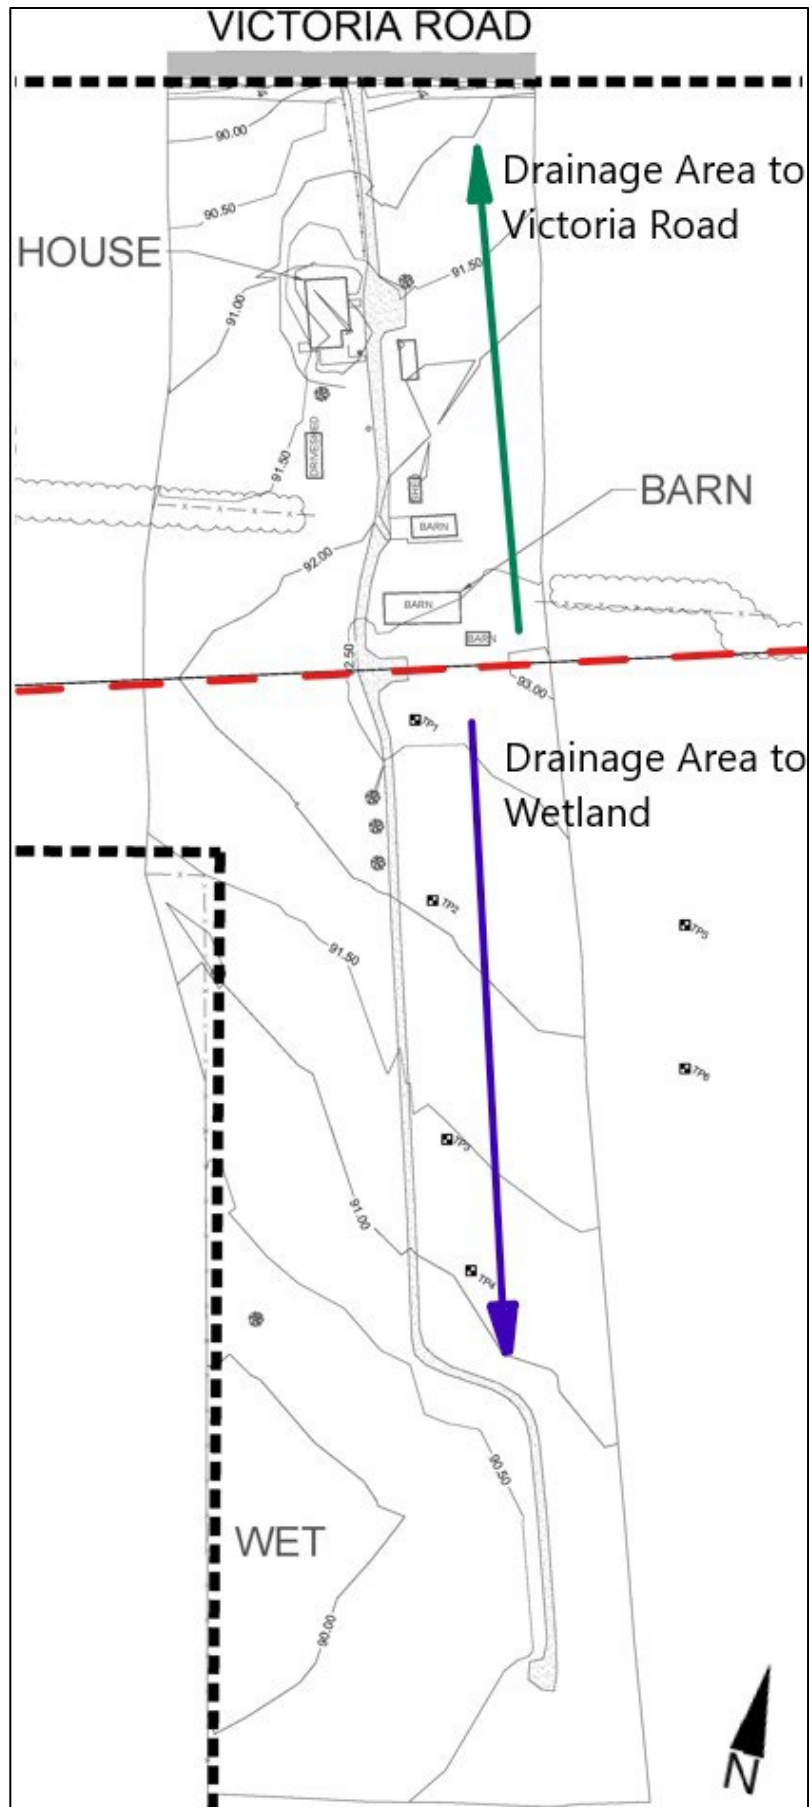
Stormwater Runoff Distribution and Topographic Elevation
